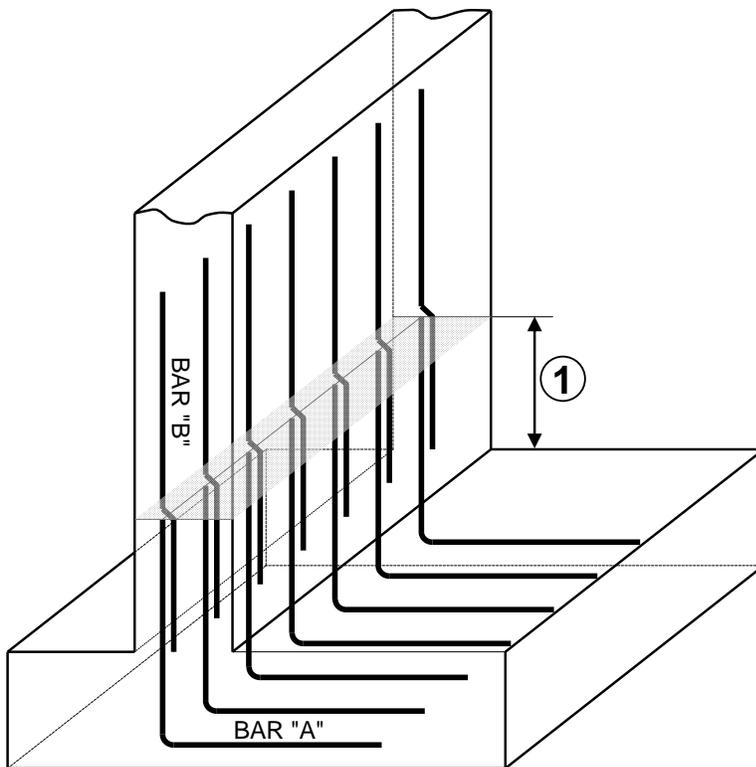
2 Cat. 2: Bars Spliced at the Footing
